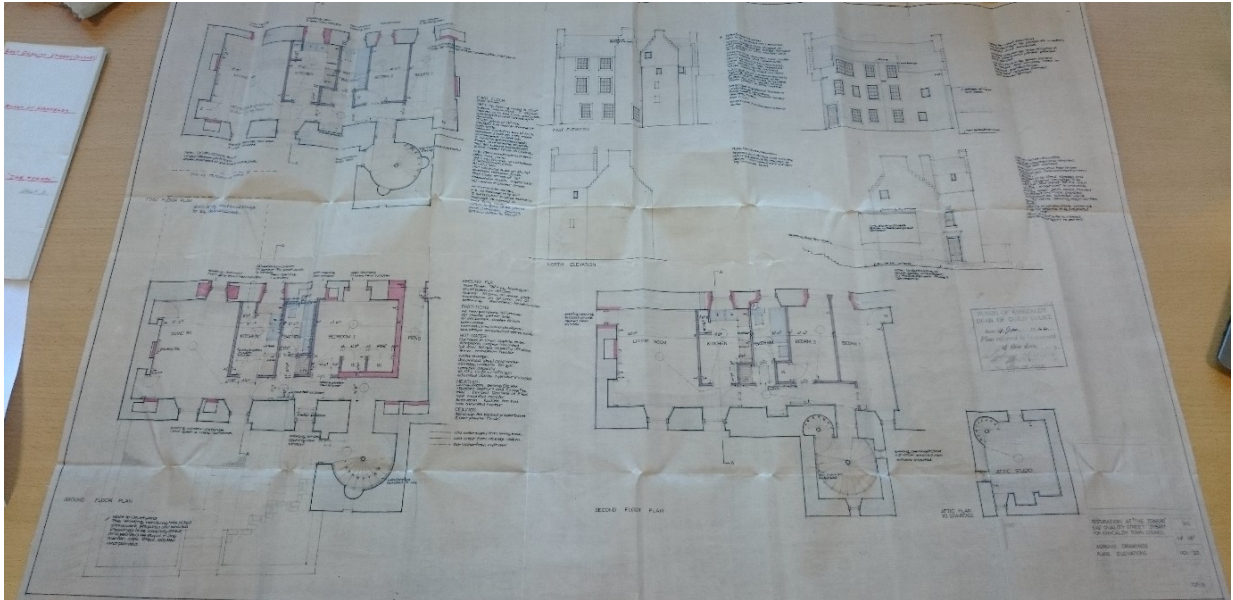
'Working Drawings Plans Elevations' for 'The Towers', November 1963. Alterations to the original structure shown in red.
